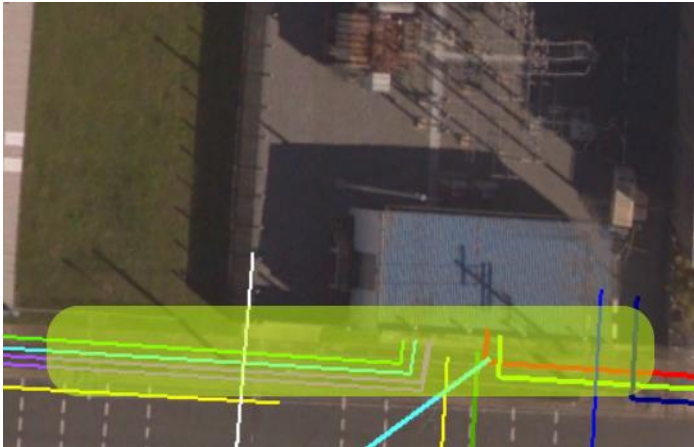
Open trench excavation planned in front of new Mackay City substation and the old Tennyson Street substation.
